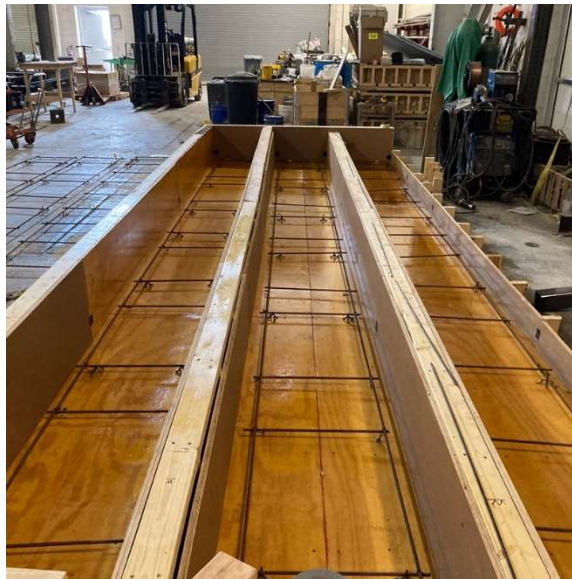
Full-Scale Panel Formwork and Reinforcement
